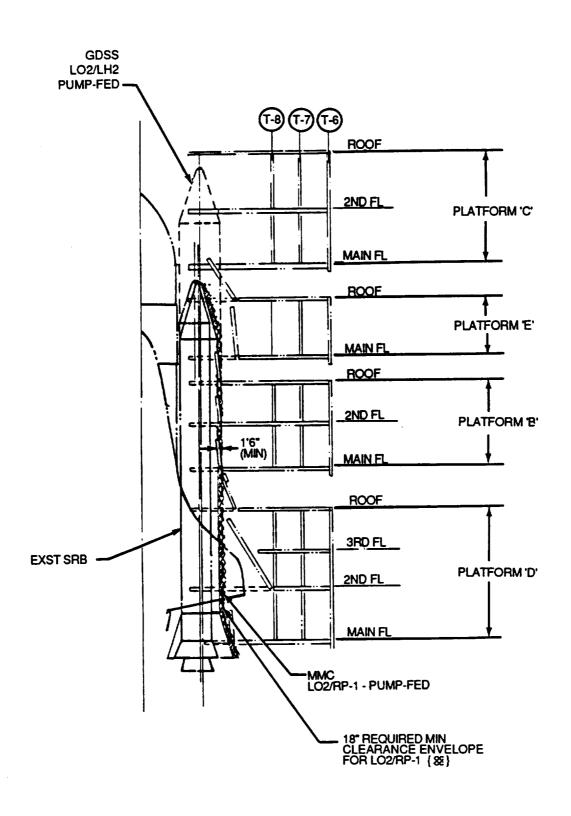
Exit Clearance With Extensible Work Platforms Retracted.
